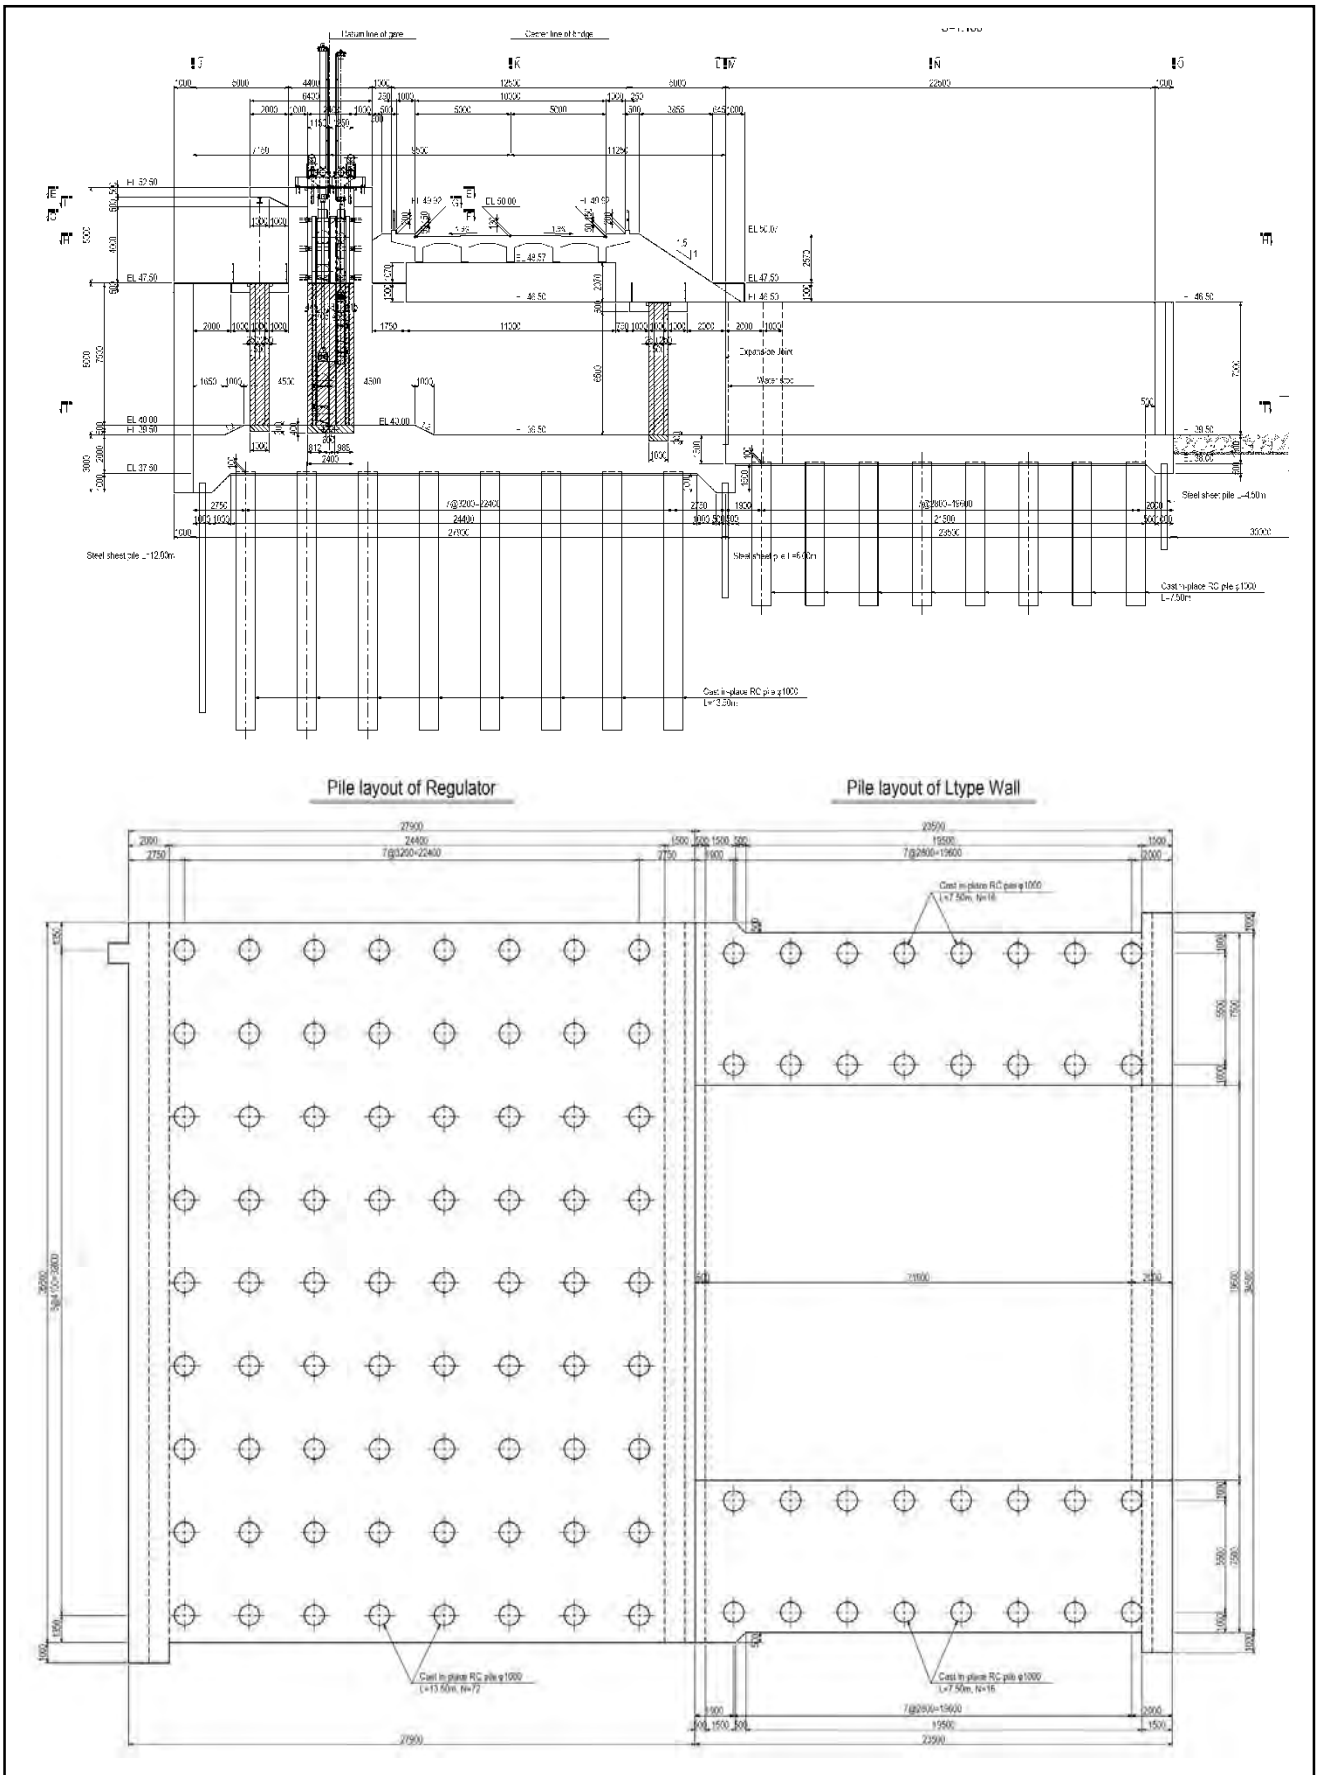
Pile layout and design of Bahr Yusef regulator and L-type wall
